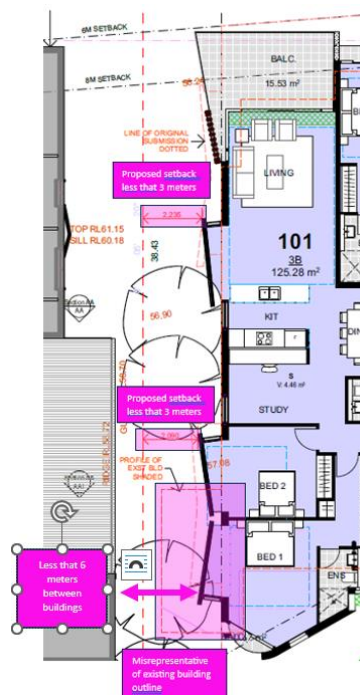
Plans - Master Set 'Level 1 Floor Plan' pg4
